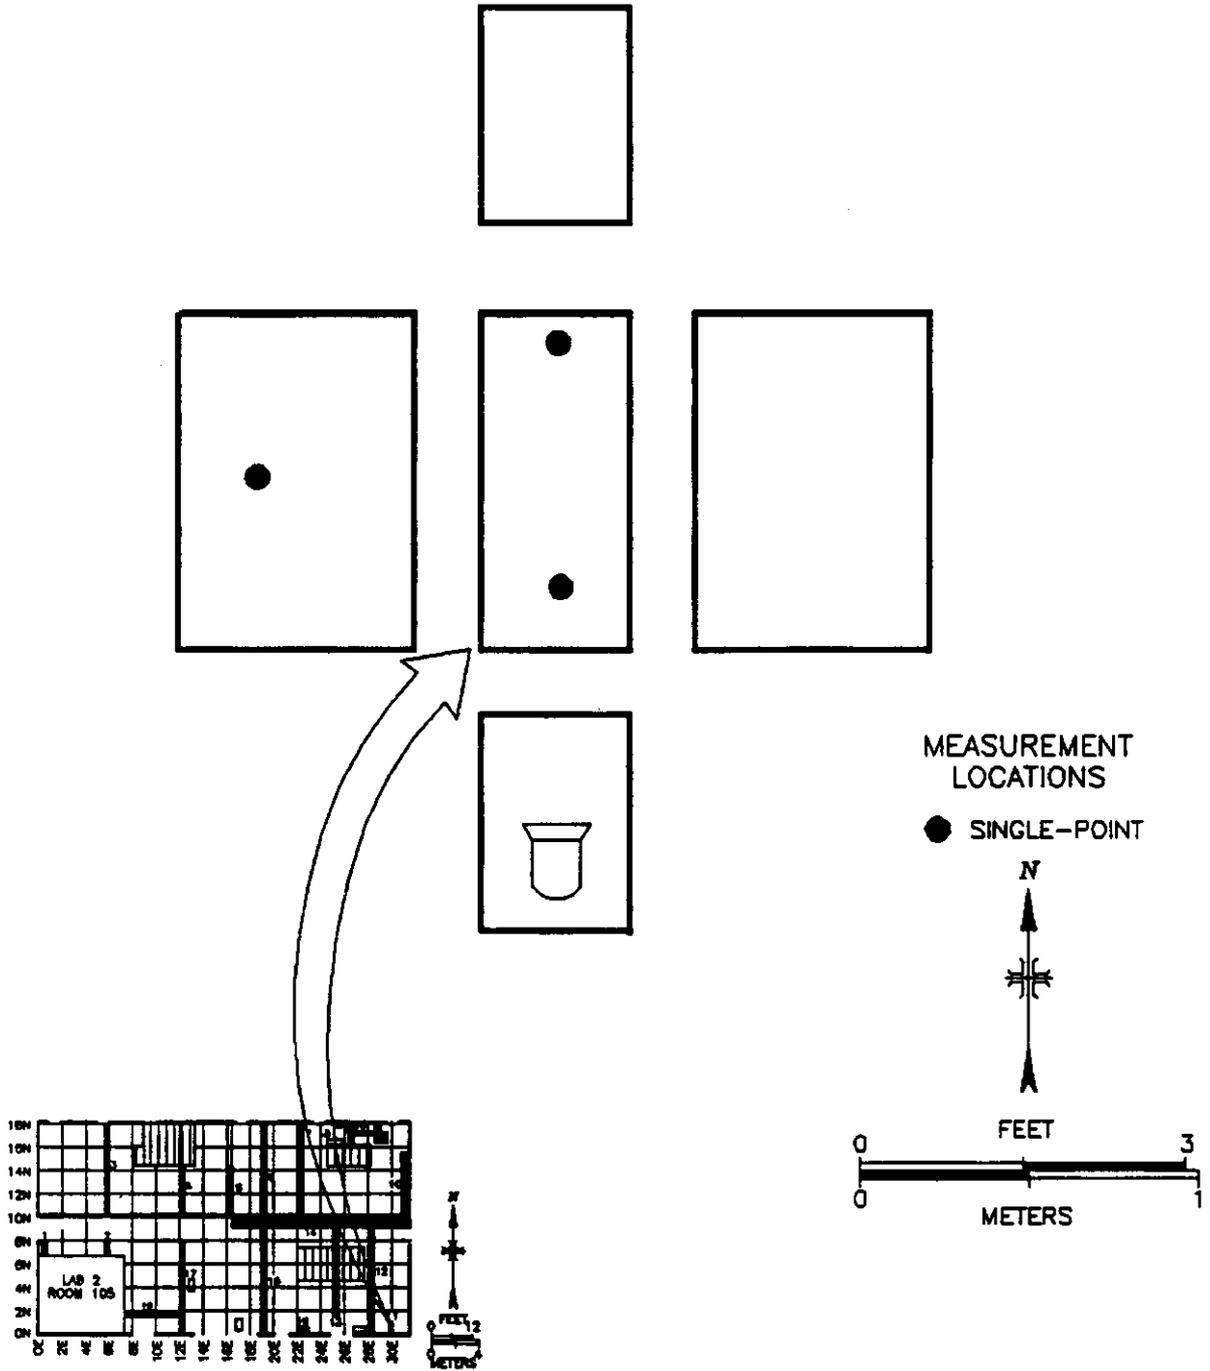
ARC Building 23, Lab 1, Trench #11 (Sump) Indicating Measurement Locations
